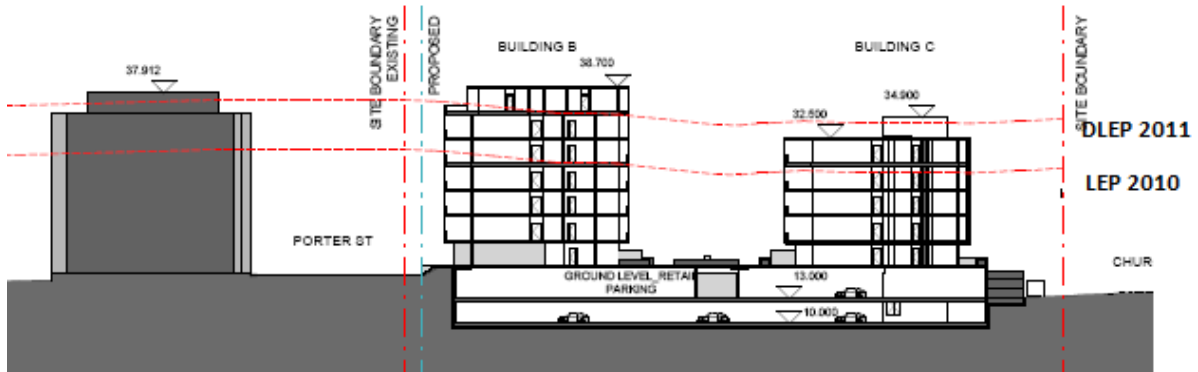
Section 2 showing Buildings B and C in comparison to the Bay One development located opposite.
